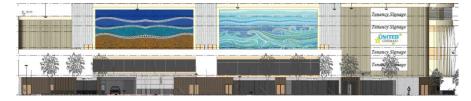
Extract from Architectural Photomontage - Southern Elevation, Warlters Street. Source: MM Atelier Architects.
